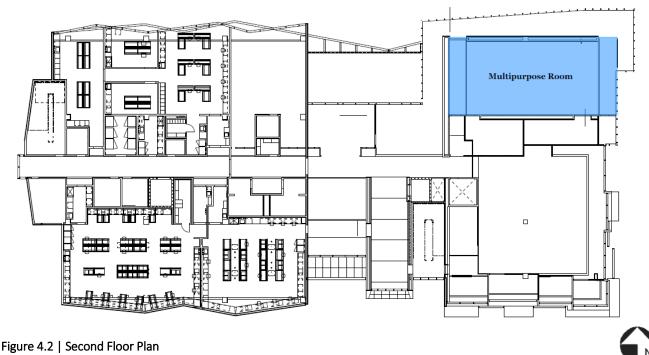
| Second Floor Plan Multipurpose Room Location
